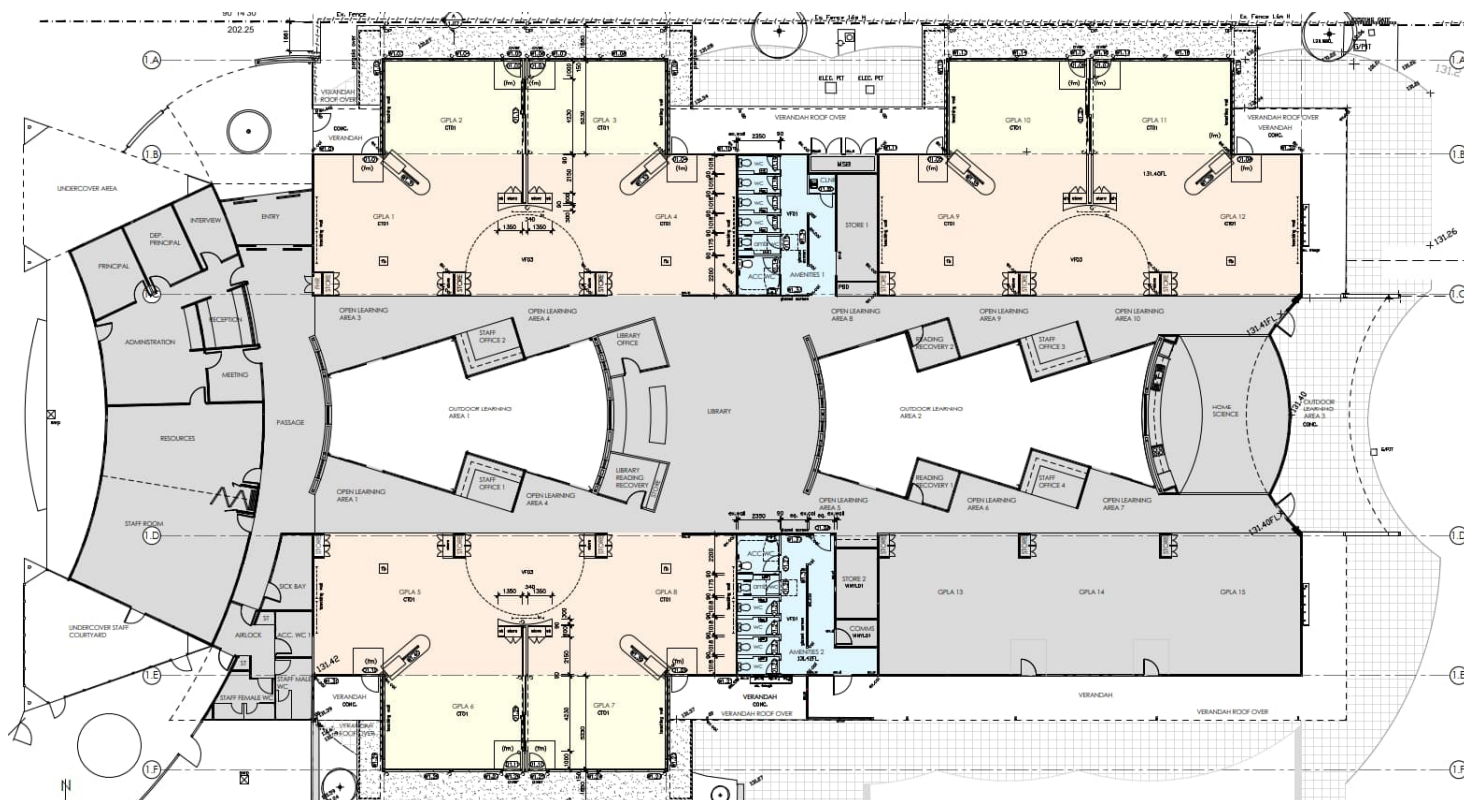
Steam Floor Plan (Source: Morton & Co Architects)
